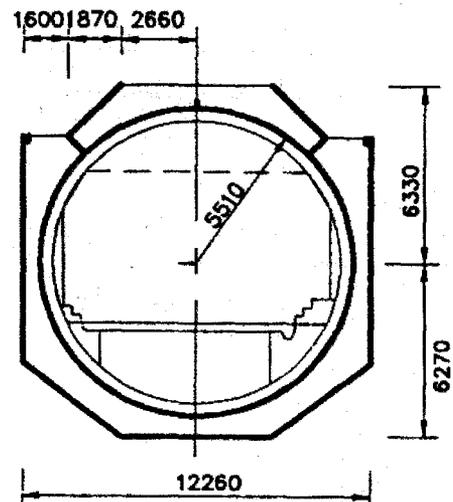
Double Steel Shell, Single Tube Tunnel
